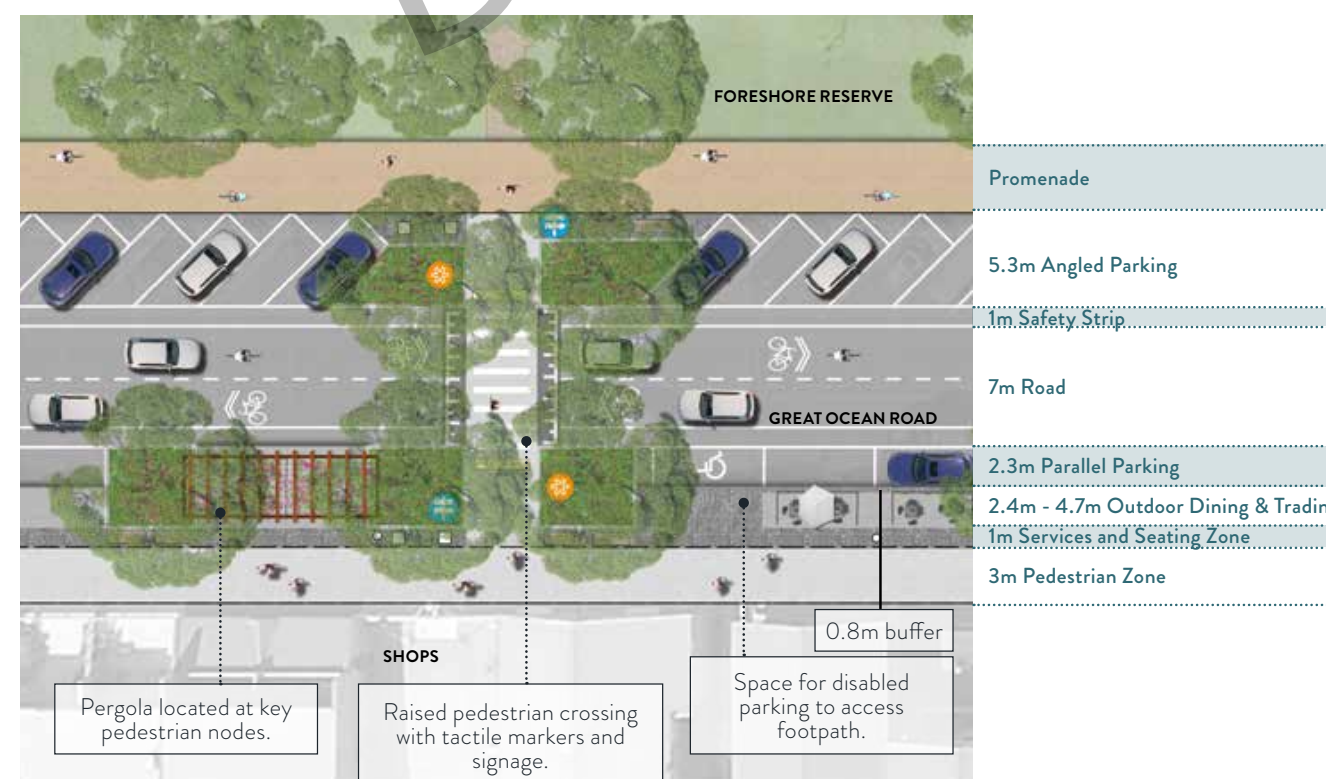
Proposed Plan - Outdoor Dining and Trading Zones - Two-Way
